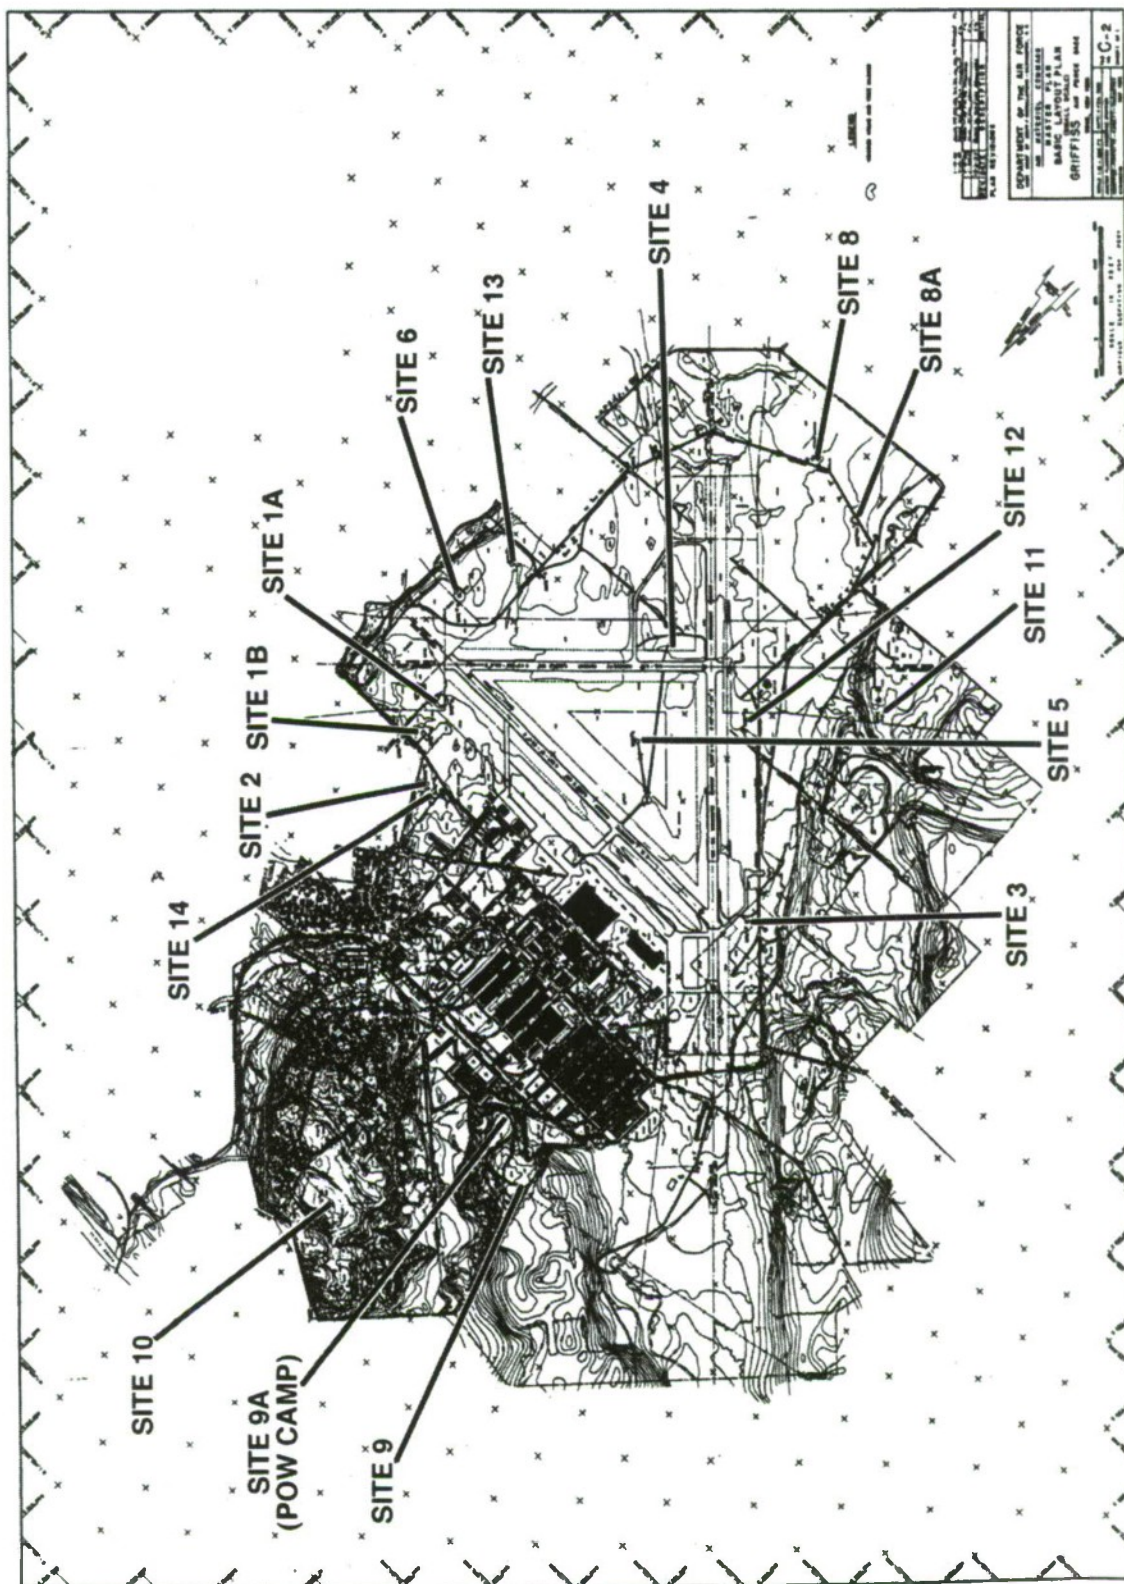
Sites 1-14, Basic Layout Plan, Griffiss Air Force Base, 4 February 1957. Site 7 is of unknown location. Site 9A was a POW camp during World War II; Site 10, the Experimental Operations Room. Site 14 is of unknown test use. Courtesy of the Environmental Planning Offices, Rome Research Site.
